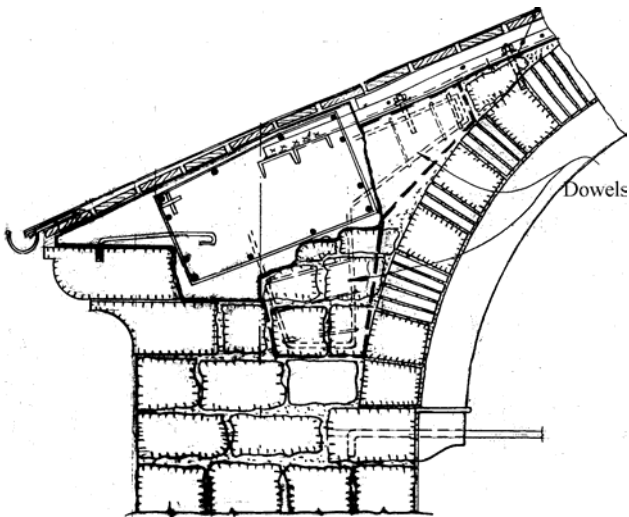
Strengthening of the damaged masonry vault (dome) by hanging it on the new r/c one located above
